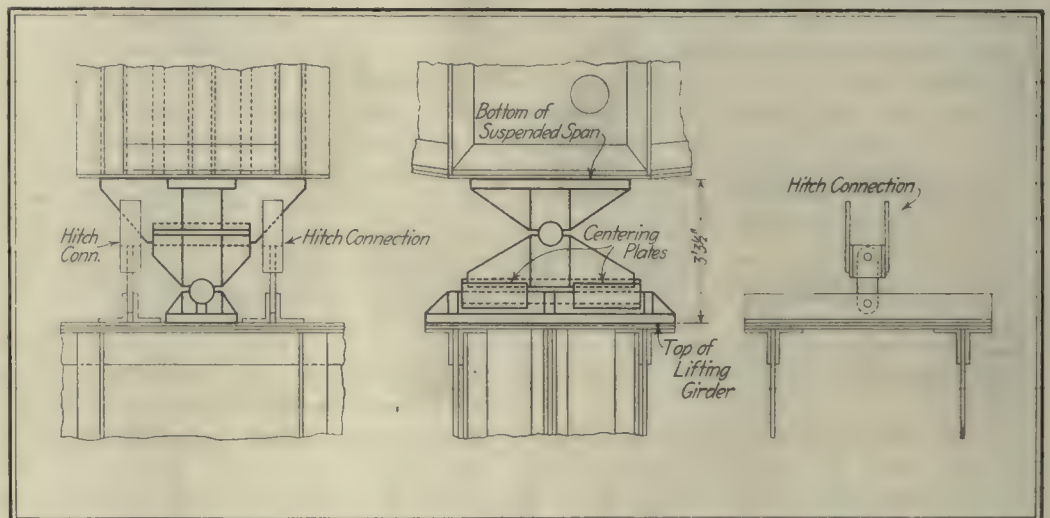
ROCKER-JOINT BEARING ASSEMBLY—HITCH CONNECTION AT RIGHT
